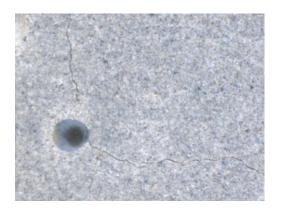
Example #1 of Associated Cracks and Voids/Bubbles of Failure Plane for Beam
